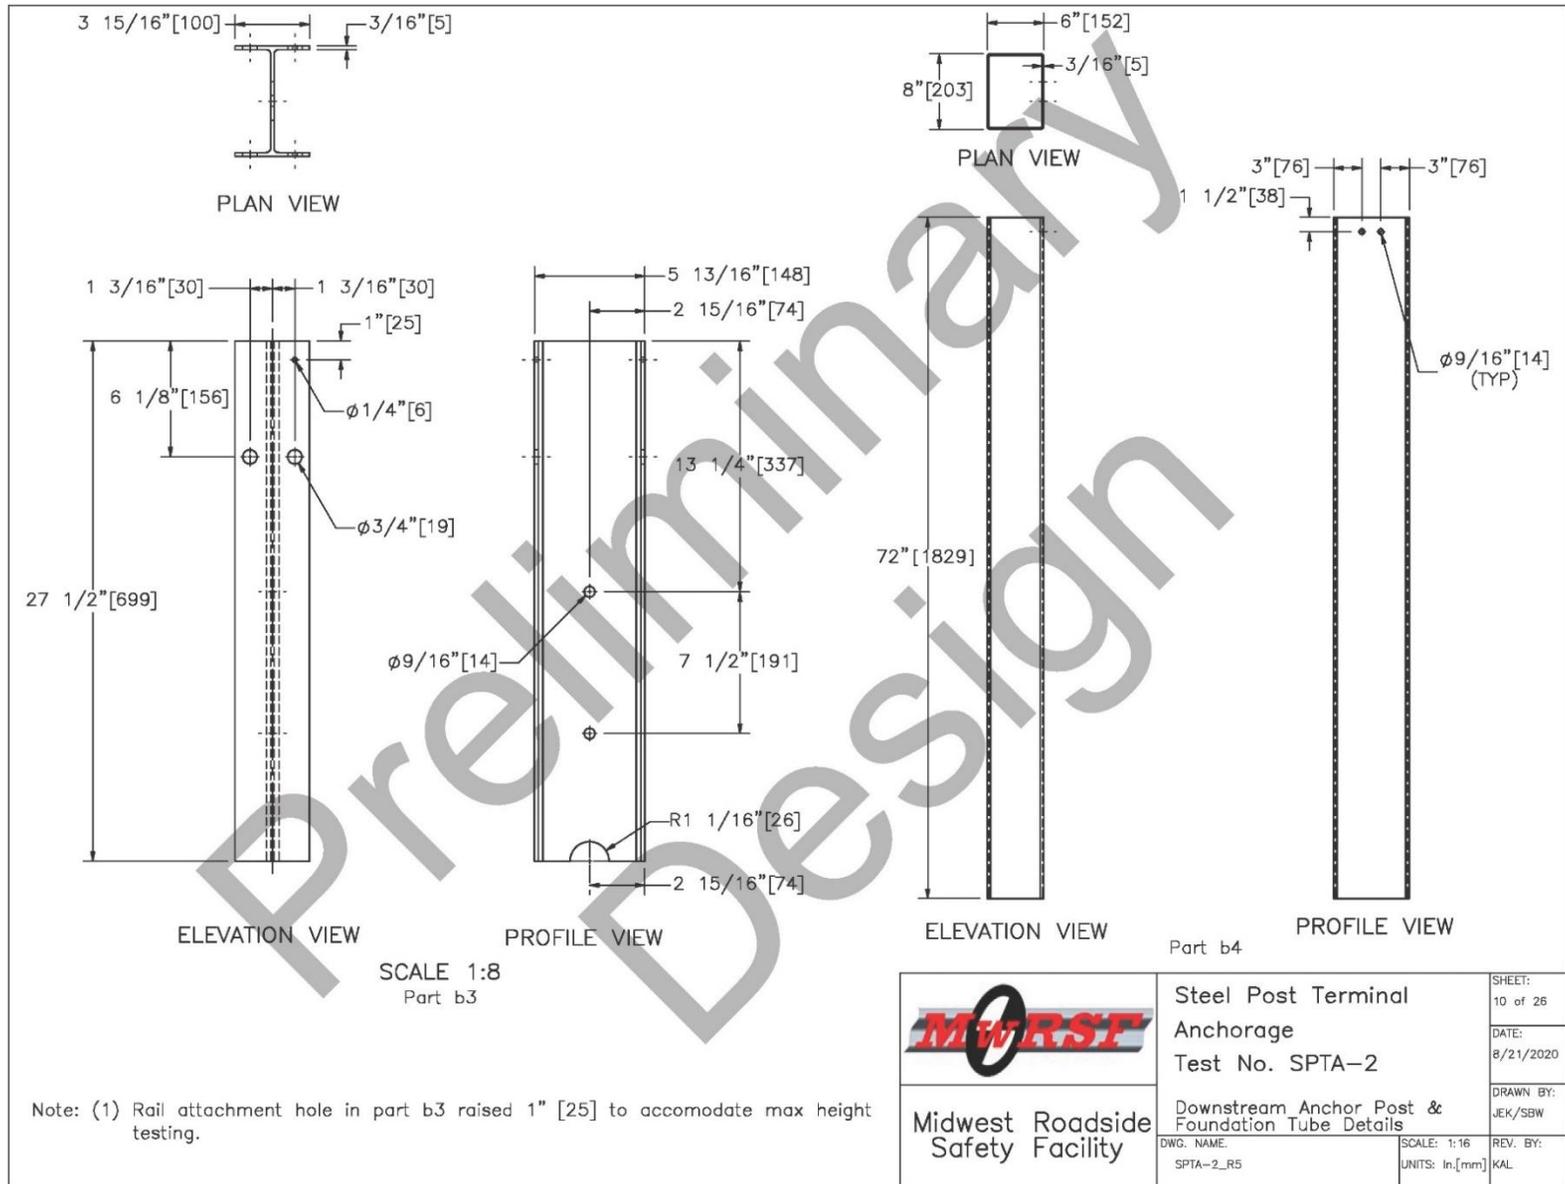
Downstream Anchor Post and Foundation Tube Details, Test No. SPTA-2
